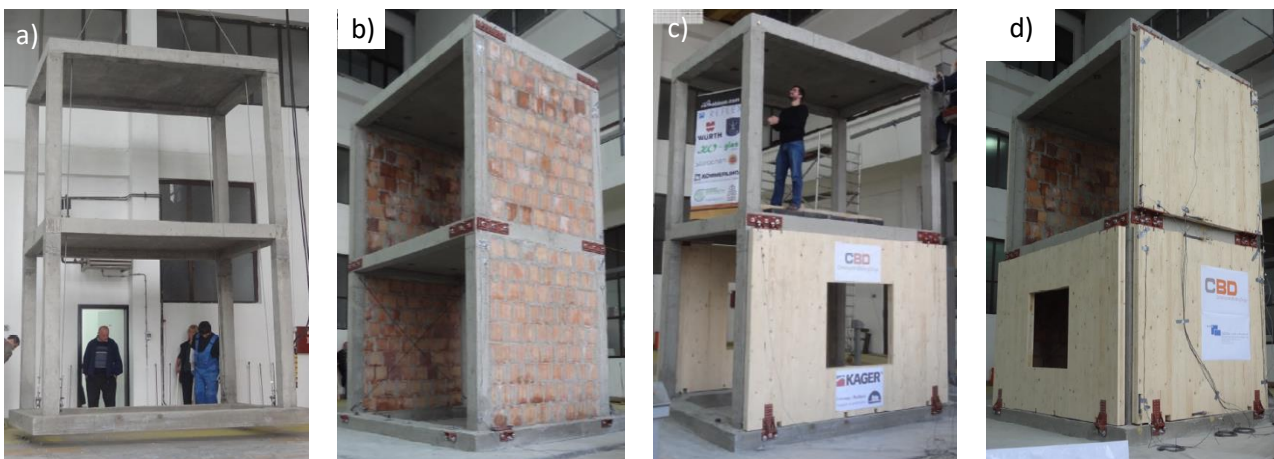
a) Bare RC moment resisting frame specimen; b) RC moment resisting frame with masonry infills; c) bare RC frame with strengthening CLT panels; d) bare RC frame with masonry infills and strengthening CLT panels – Source: [121]
